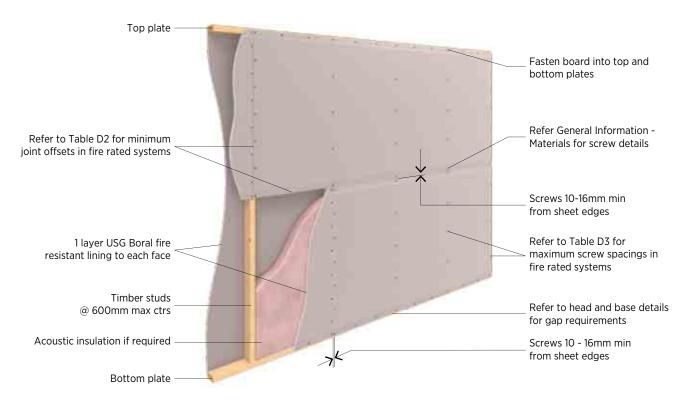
Fire Rated Timber Stud - Horizontal Fixing - Single Layer
